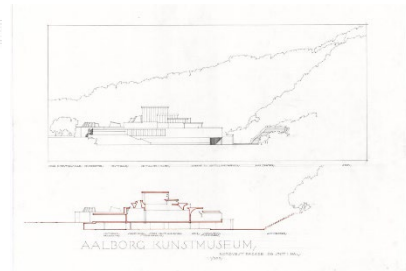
Section and elevation of the museum (Alvar Aalto foundation)
